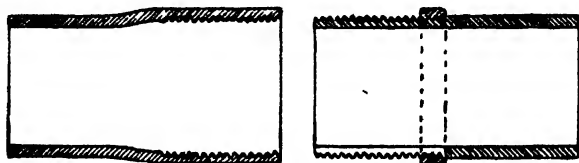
INSERTED JOINTED CASING WITH DRIVING RING.
